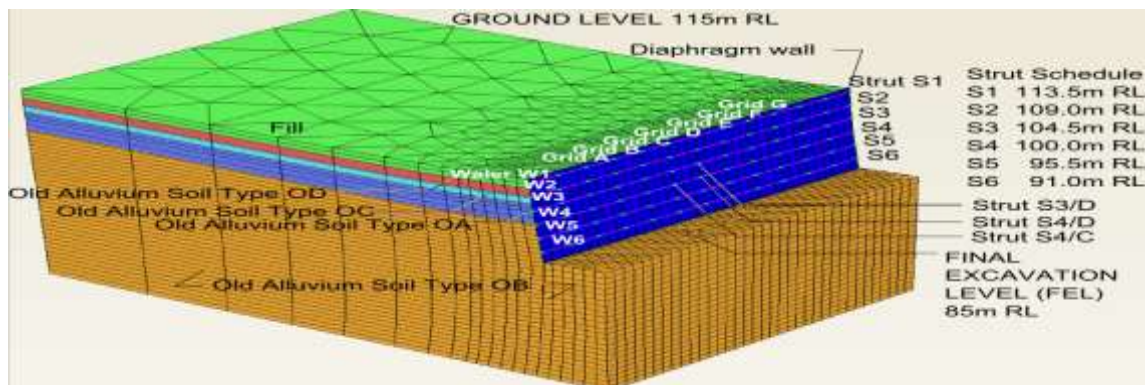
3D Finite element model using PLAXIS 3D Foundation
